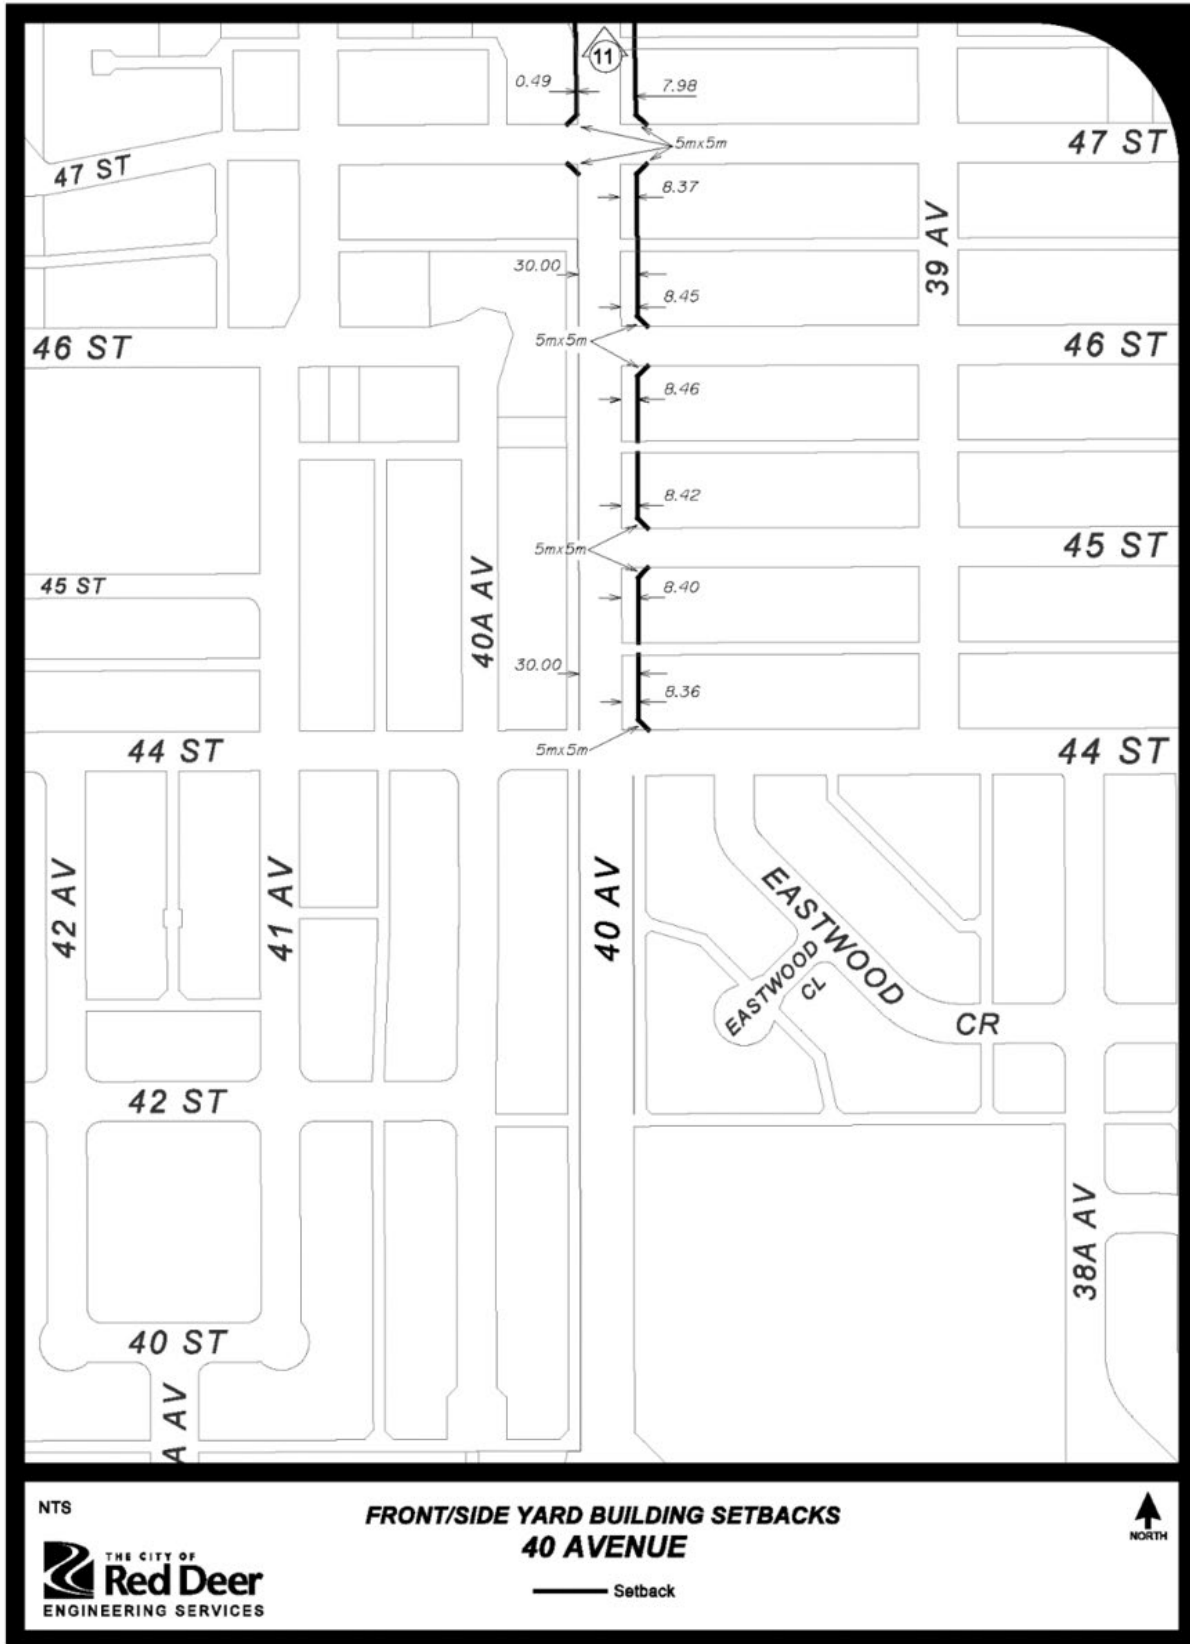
Front and Side Yard Building Setbacks - 40 Avenue (2)
